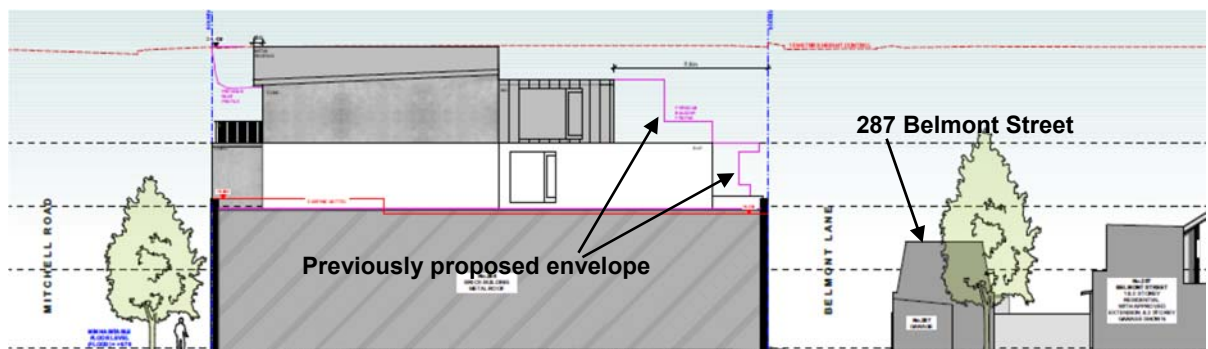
revised side southern elevation. Outline of the previously proposed envelope shown, indicating the extent of reduction in the upper floors (as per the recommendation of DAP).
